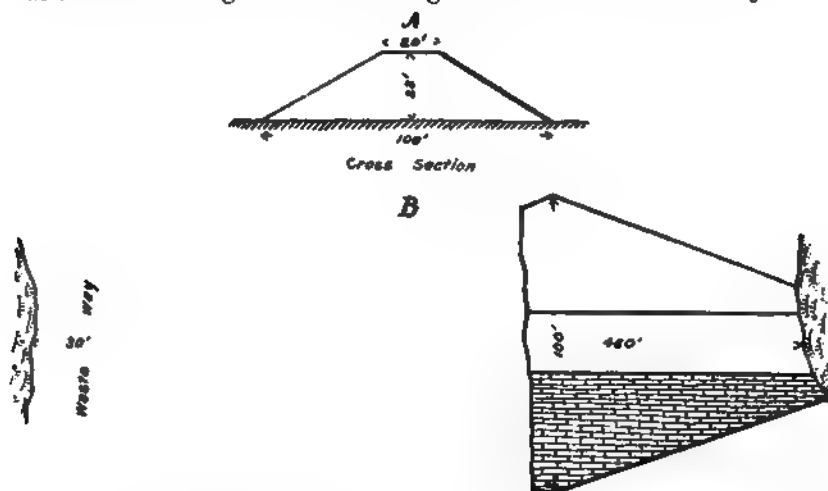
Turlock canal. Plan and cross section of Dry creek drainage dam.
